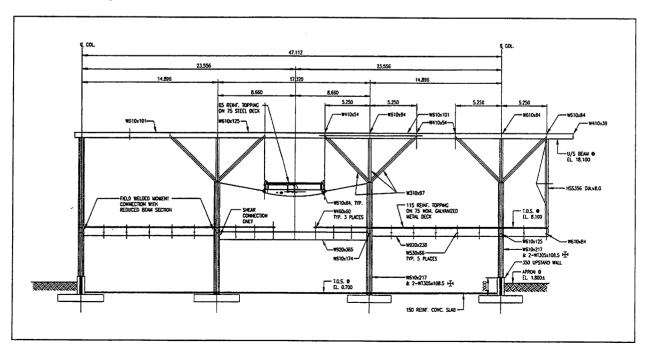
Section through the baggage hall of the west chevron ITB expansion
